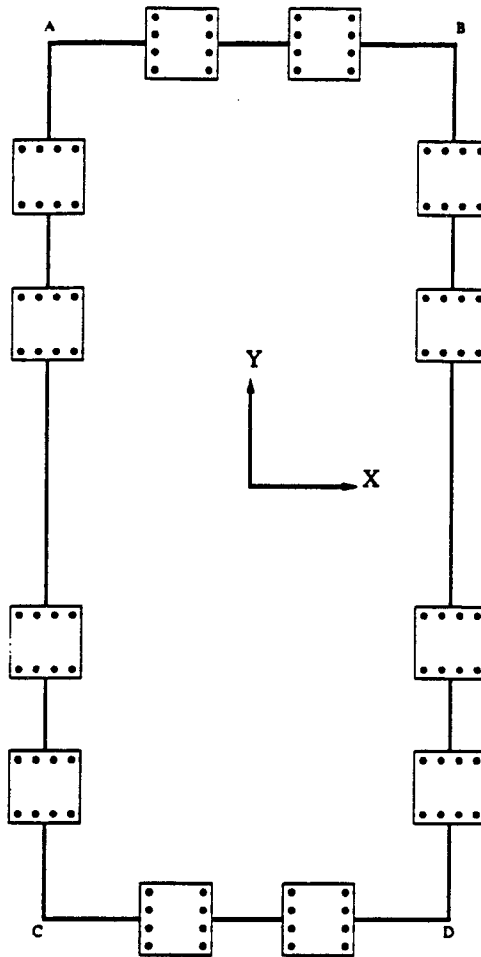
Configuration of vertical steel bars for 24" x 24" columns
